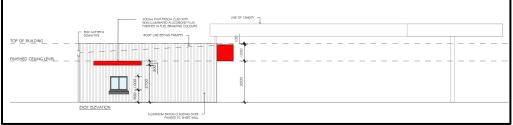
East Elevation – facing Enfield Avenue (Source: DA005, dated 24/6/24)
